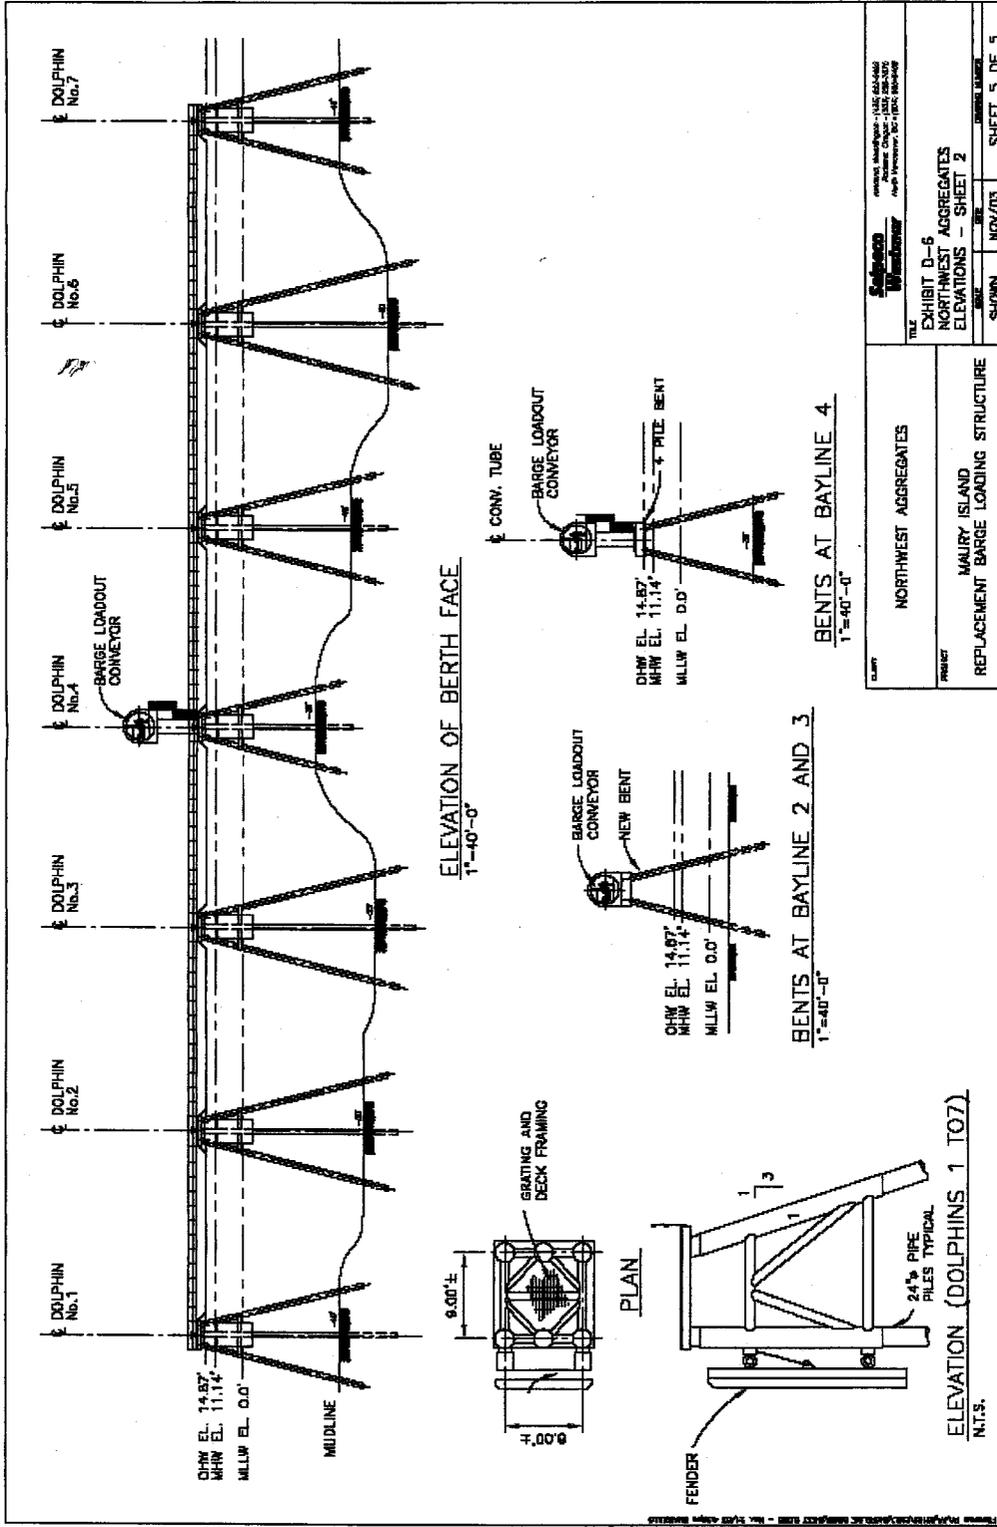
Proposed New Dock Configuration - Elevation view of Proposed New Dock Face
